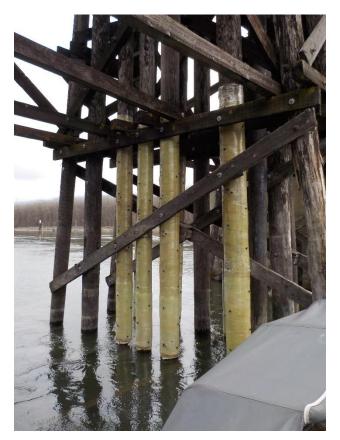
Fiber-reinforced shear panels on a forestry bridge in British Columbia.
